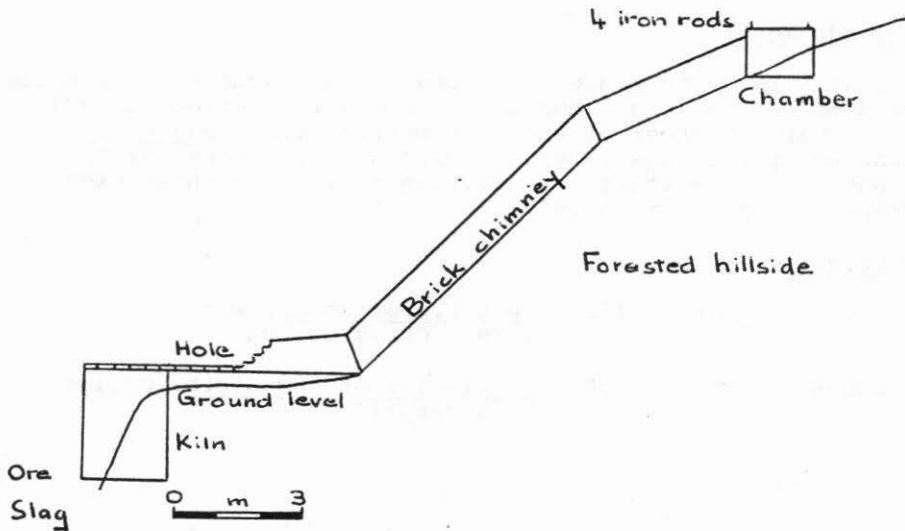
Longitudinal plan of the Tarawera smelter and chimney.
